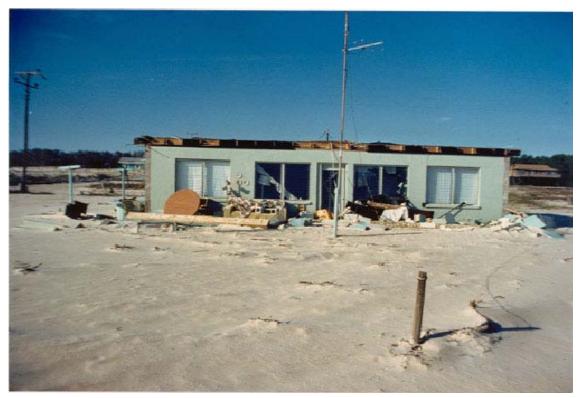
Structural roof damage due to wind and conrete block porch destoyed by waves.
